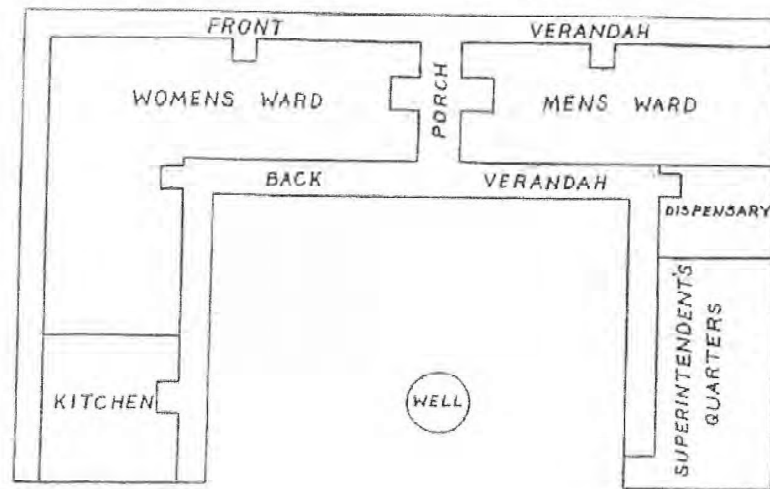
Floor Plan of Bathurst Hospital c1870 as drawn by Andrews, not to scale.
